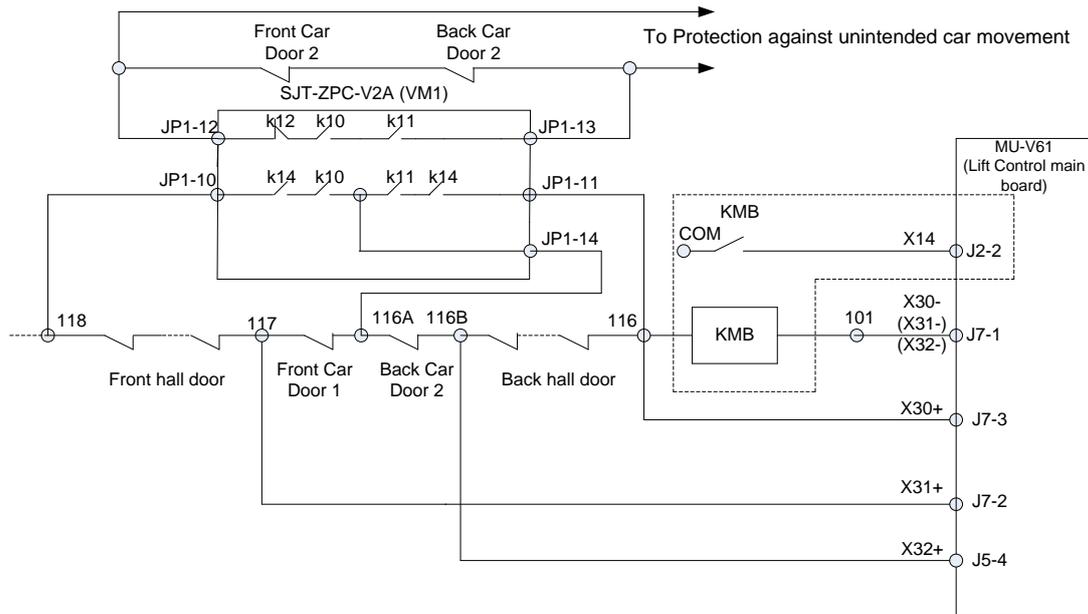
Advance door open & re-leveling & UCMP test & Door short detection control when two door (suit for geared machine)
